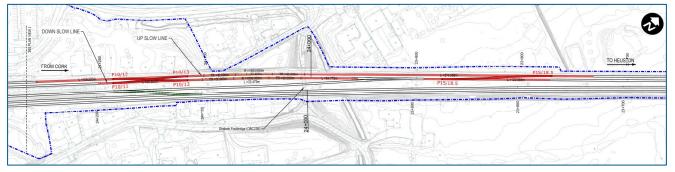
Adamstown Station – Track Plan Layout (1 of 3)
